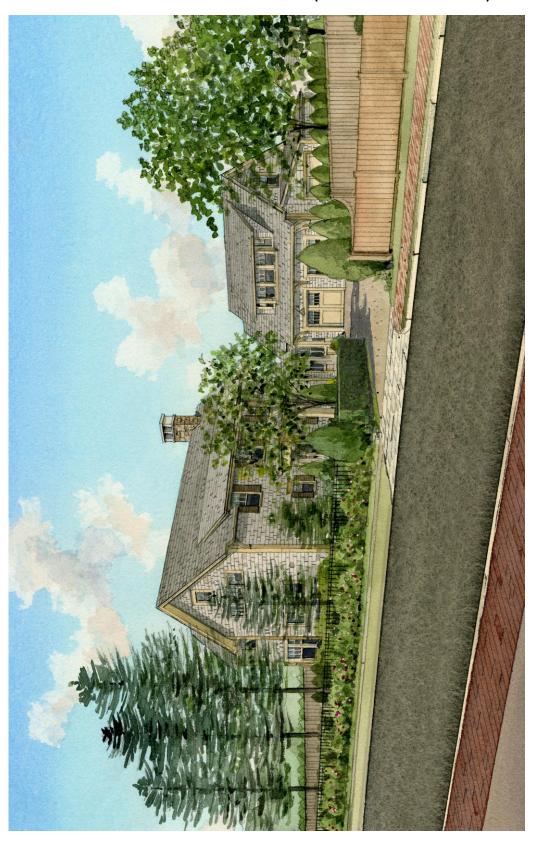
PROPOSED STREETSCAPE RENDERING (VIEW FROM UNION STREET)
